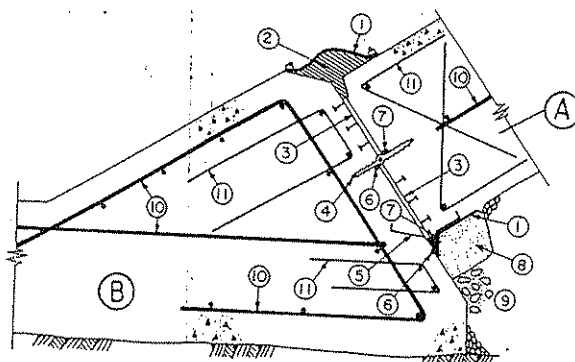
Concrete face sealing. Junction of the sealing and the plinth, perimetric joint (example Salvajina dam, Sierra et al. 1985 and ICOLD 1989a).
